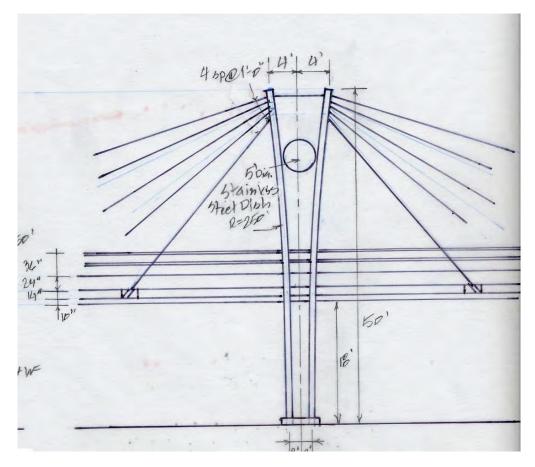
Elevation View Sketch of Iconic Bridge by Bridge Columbia
